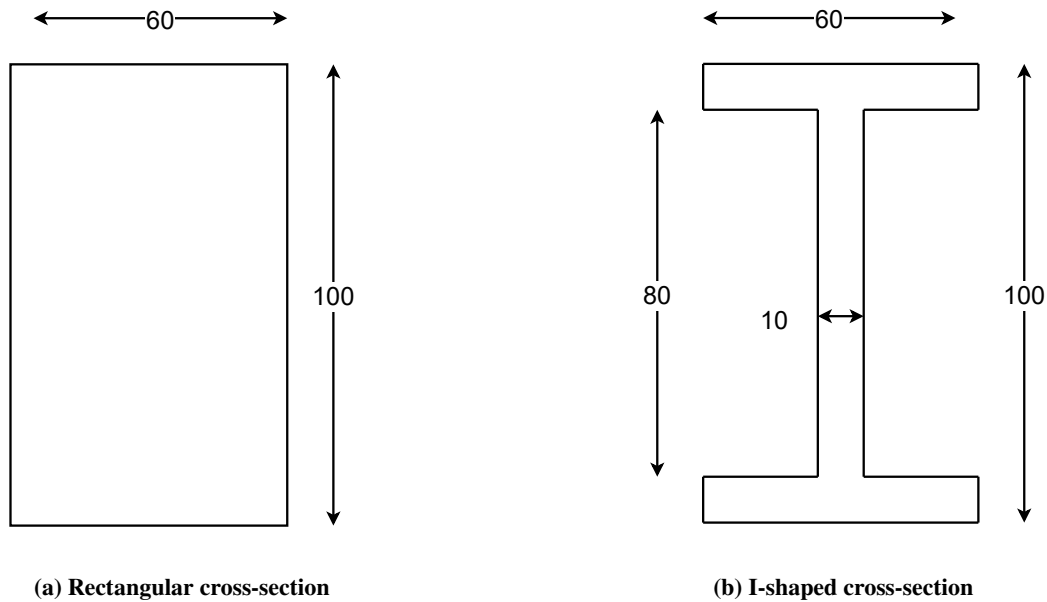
Dimensions for rectangular and I-shaped cross-sections
